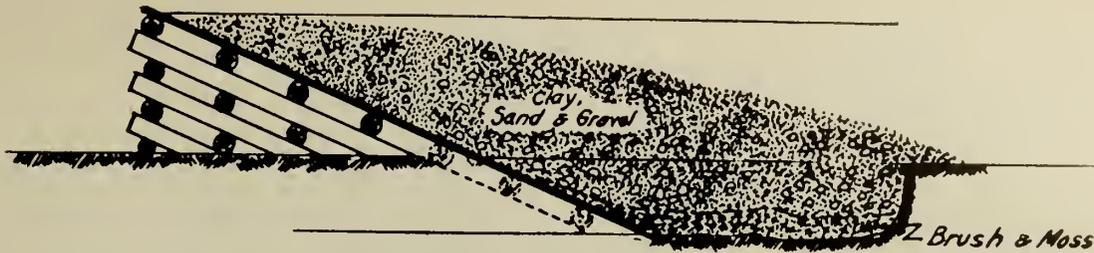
Typical Section—Hollow or Beaver Type Driving Dam.
